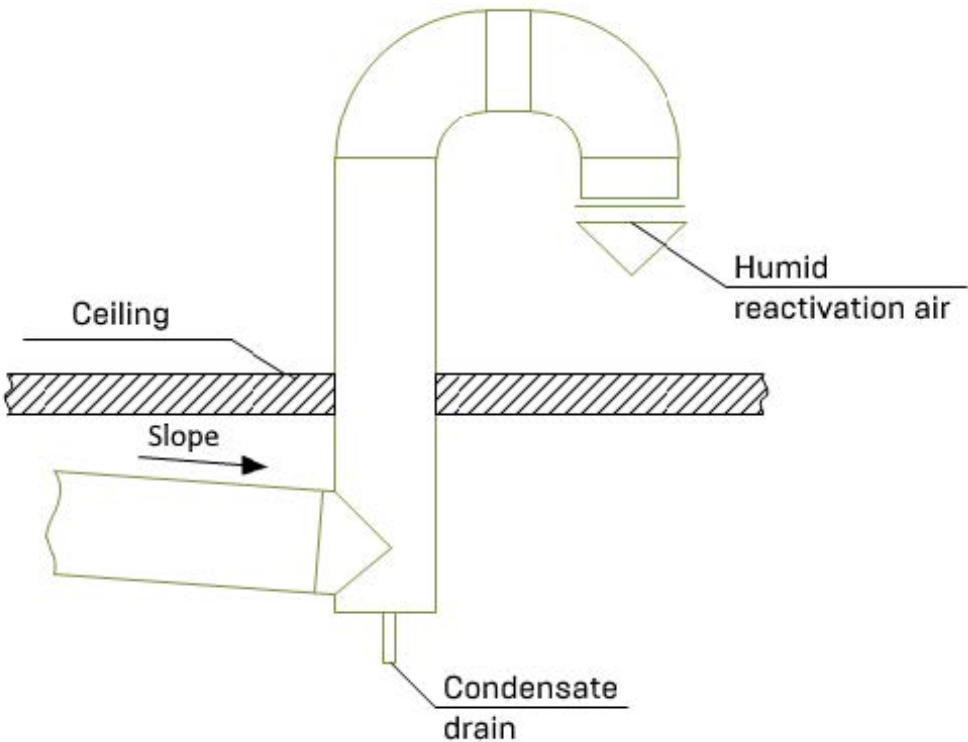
An example of laying a vertical duct for exhaust reactivation air
